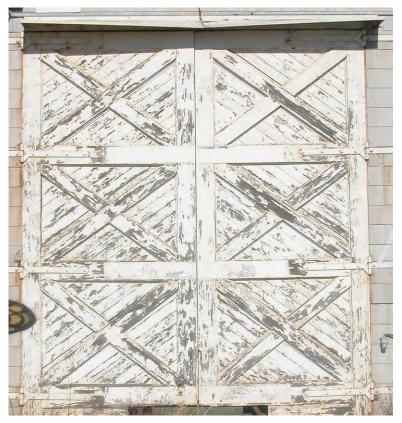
Door detail, Building 991. Each door has three cross-braced panels with diagonal sheathing.
